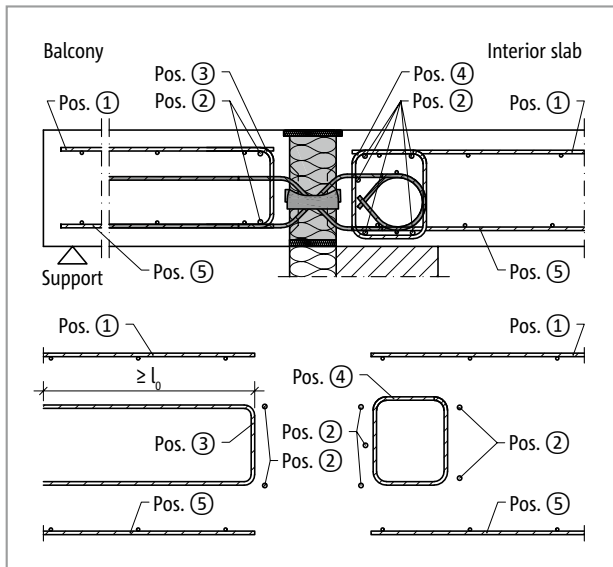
Schöck Isokorb® T Type CQ-VV1 up to CQ-VV5: On-site reinforcement
